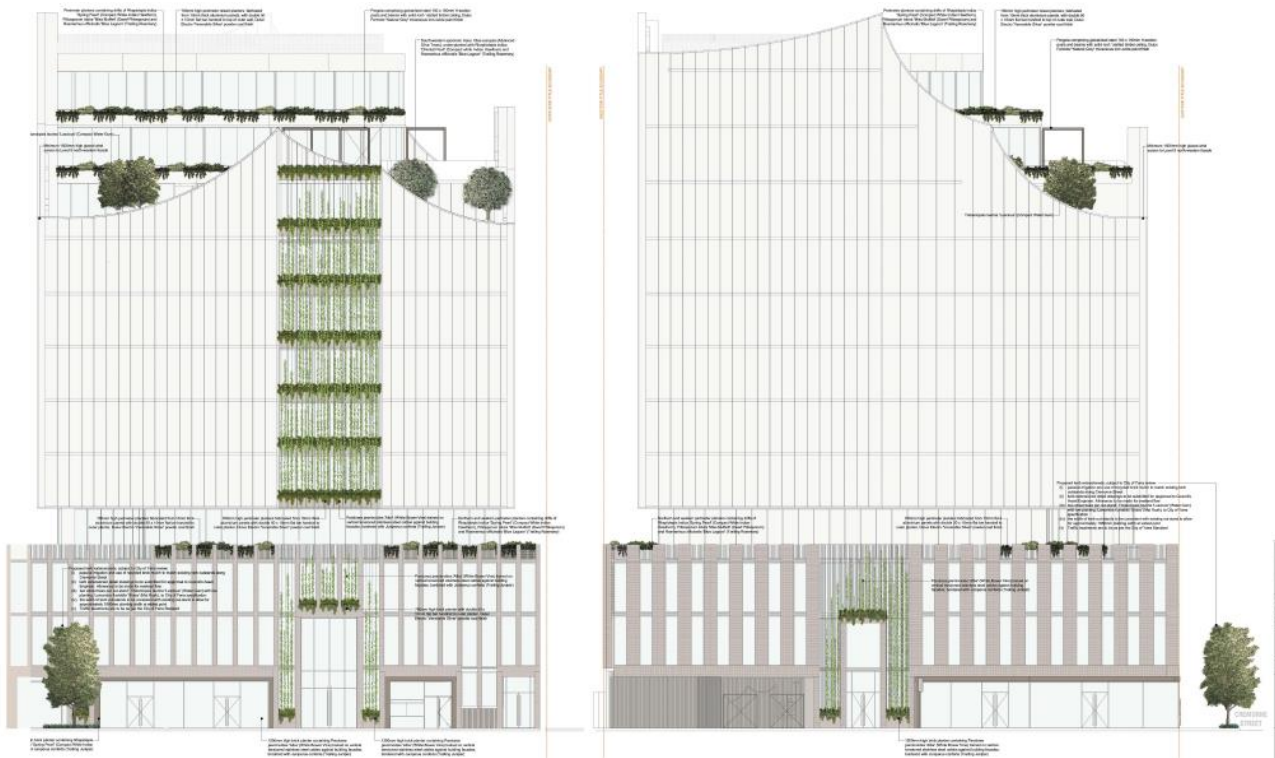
Landscape plan showing vines planted on (left to right) west and north building elevations (Source: Application)
